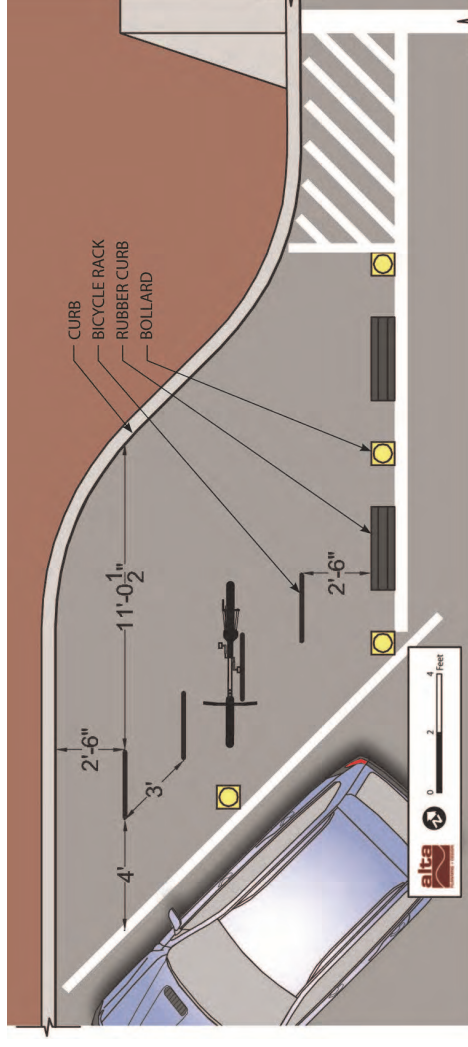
3rd Avenue and B Street Bicycle Parking Plan View
